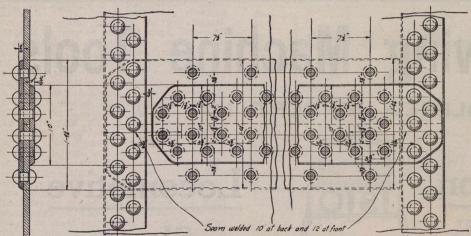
1%-in. rivets; 1 3-16 in. holes.
